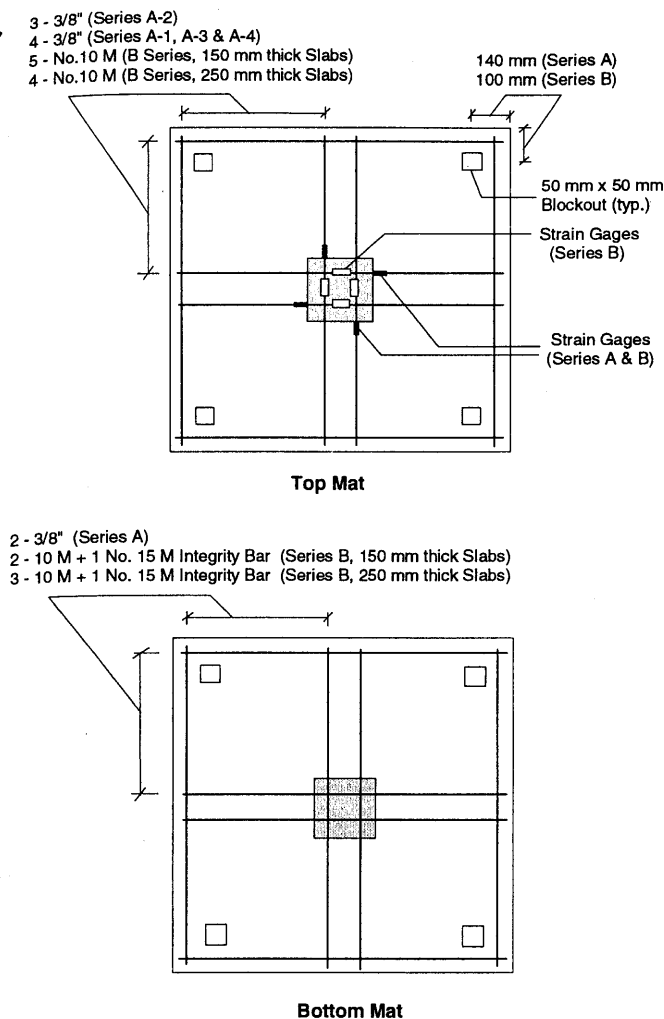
Slab Reinforcement and Strain Gauge Layouts
